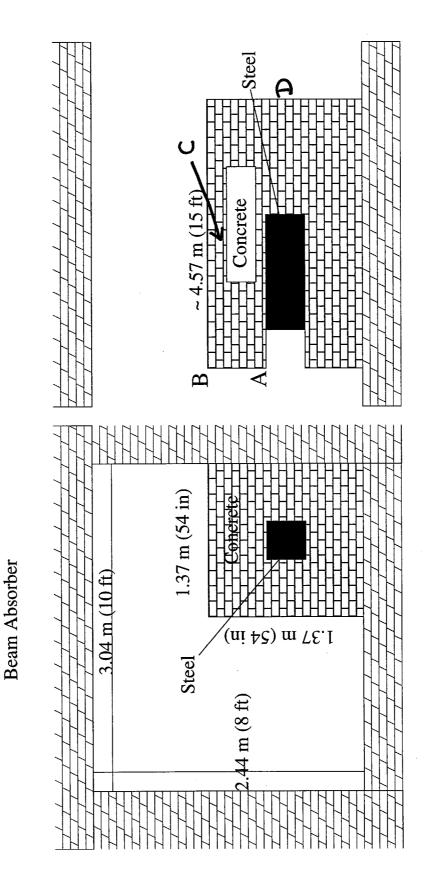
A schematic view of the 8 GeV beam absorber in the beam line tunnel (design II)
